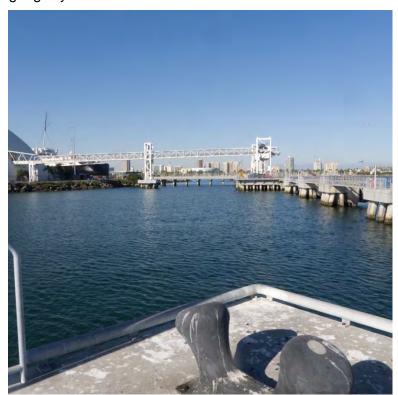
Facing north- View from dock of Long Beach Cruise Terminal building, passenger gangway and southern catwalk.
